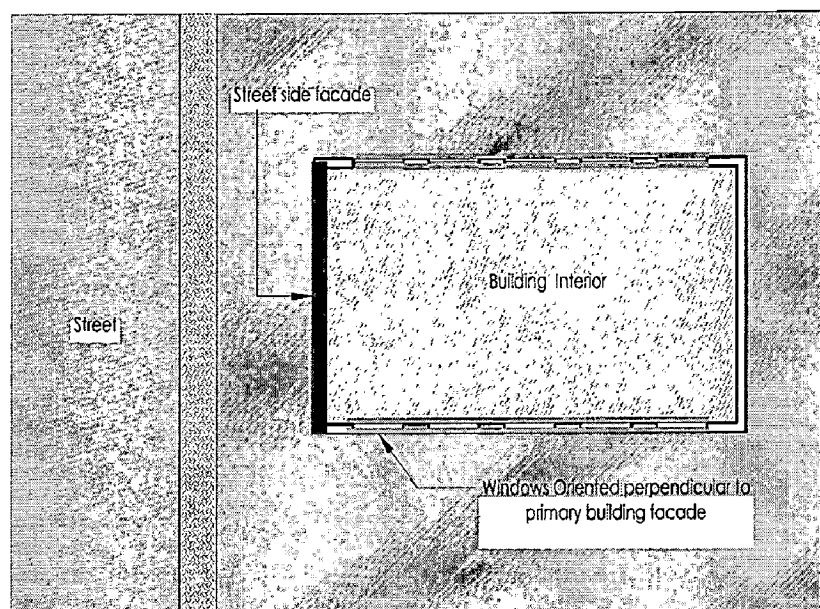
glazing should be avoided on the road side façade. (Source: FEMA 426, 2003)
